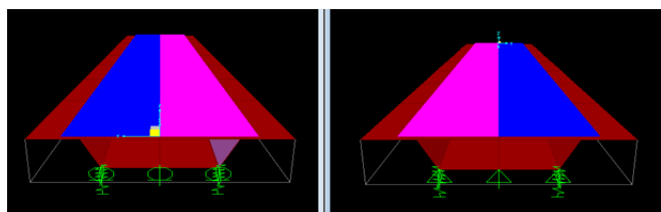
Trapezoidal box girder model for span 40m and girder depth of 1.8m
